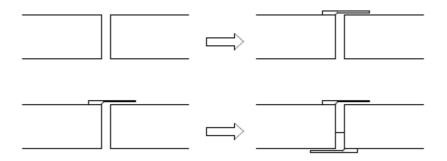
Rebate (meeting edges) - Add (one rebate)
